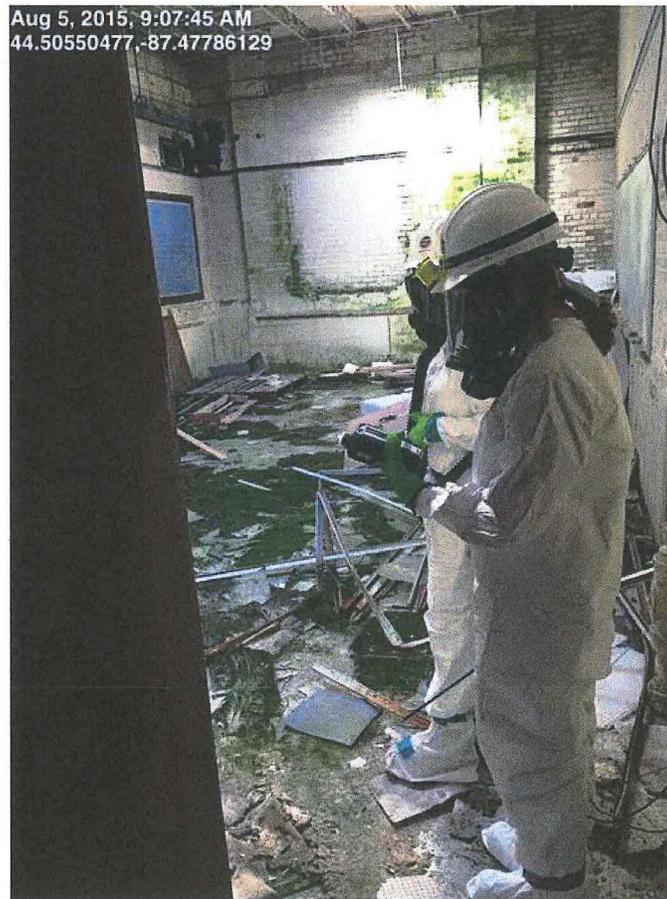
EPA air monitoring during assessment recon; conditions on first floor
